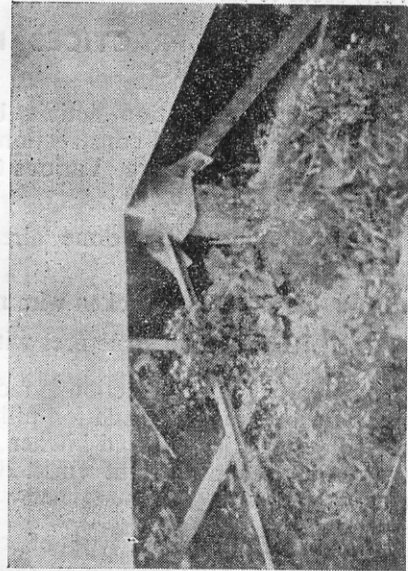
Diagonal Bracing to the columns—Strengthening Measure.
